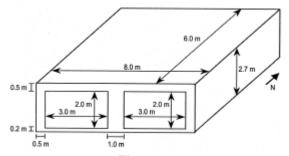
ASHRAE 140 Base Case for Building Envelope and Fabric Load Tests
